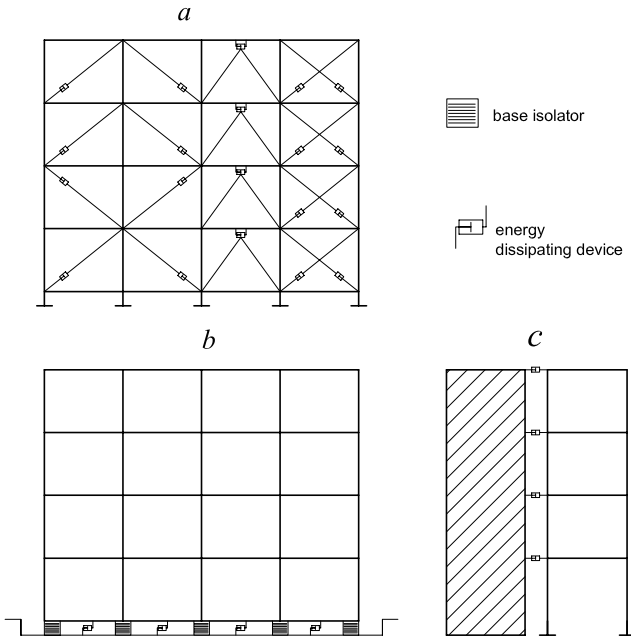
EDD's location in buildings. (a): Diagonal elements. (b): Base level elements. (c): Connecting elements
